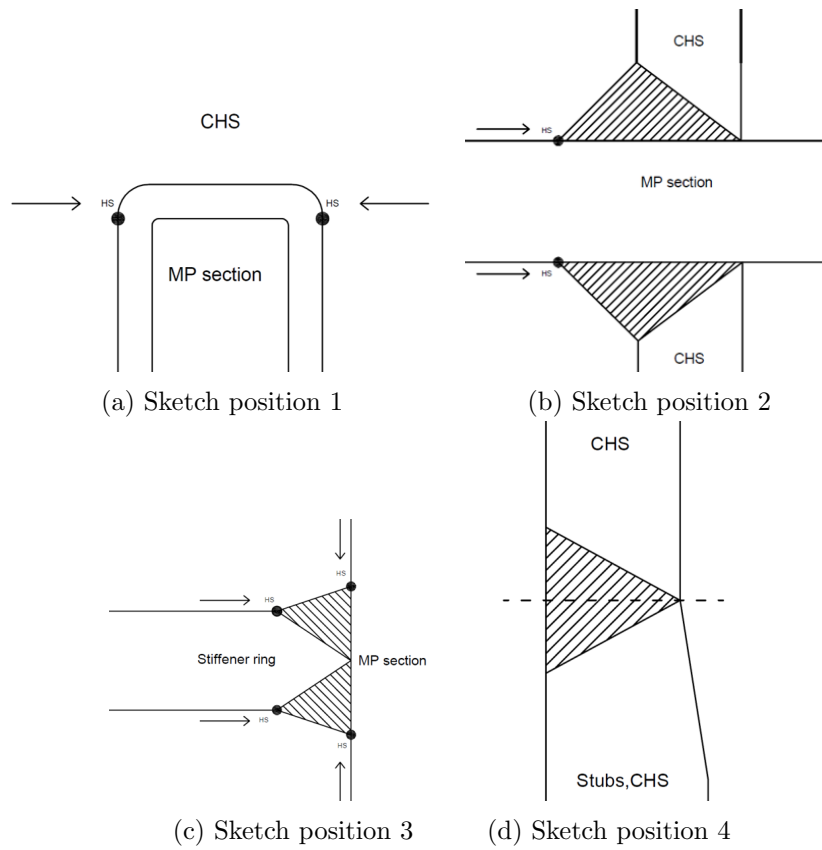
Sketch of the welded position 1 to 4 with the HSS read out direction
